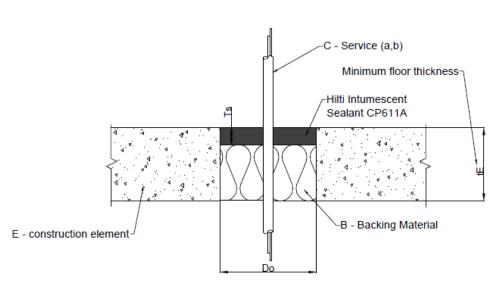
Side View, seal type 18, Steel and uPVC Conduits or tubes ≤ 16mm OD in concrete floor, CP611a
